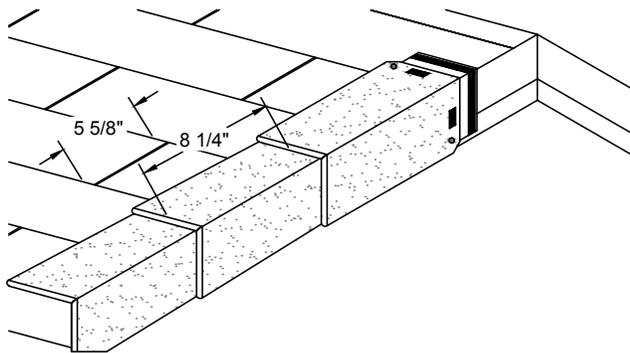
Installation of EZ-Ridge® Shingles on Rake Edges of the Roof
